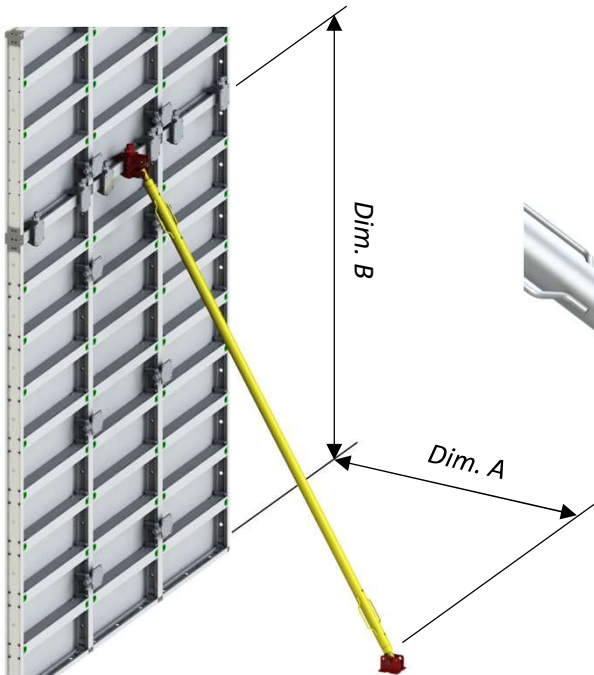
Typical Pipe Brace Assembly With One-Way Base & Clamp/Two-Way Head Assembly
